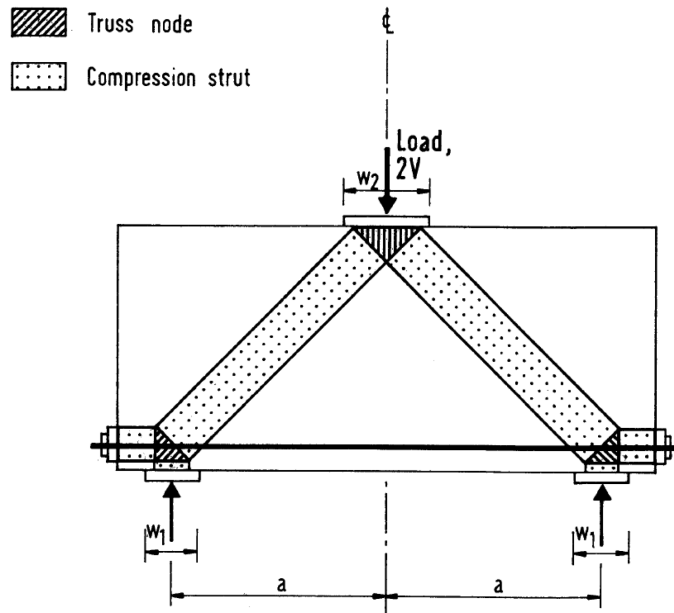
Strut-and-tie model for prestressed concrete deep beams (Tan and Mansur 1992)
